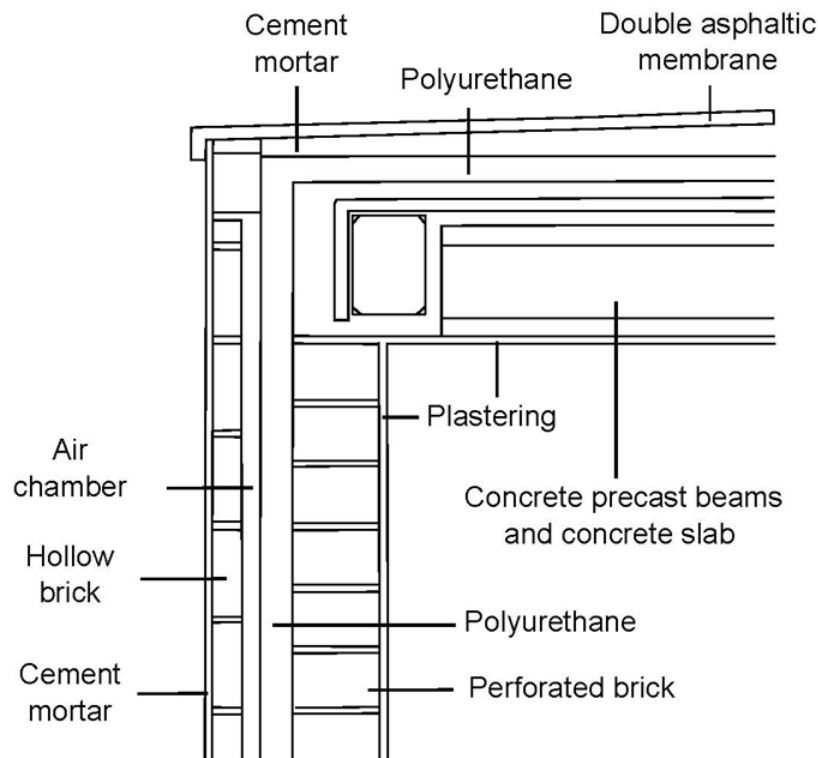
Construction profile of the experimental cubicles in Puigverd de Lleida (Spain).
